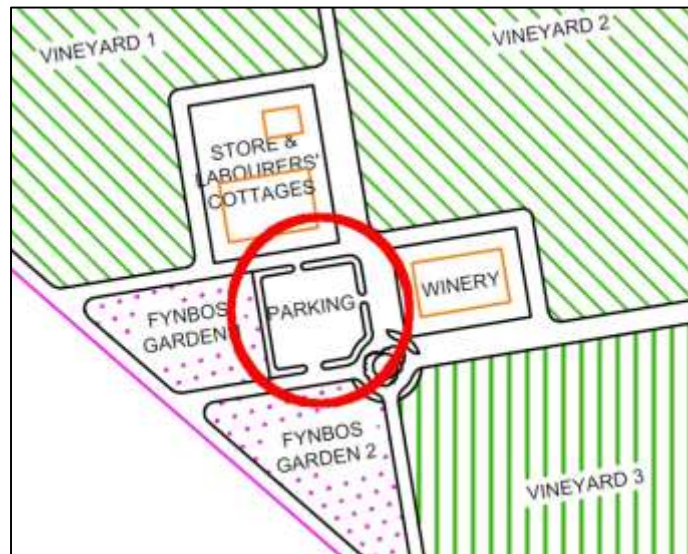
ON- SITE PARKING PROVISION FOR WINERY
